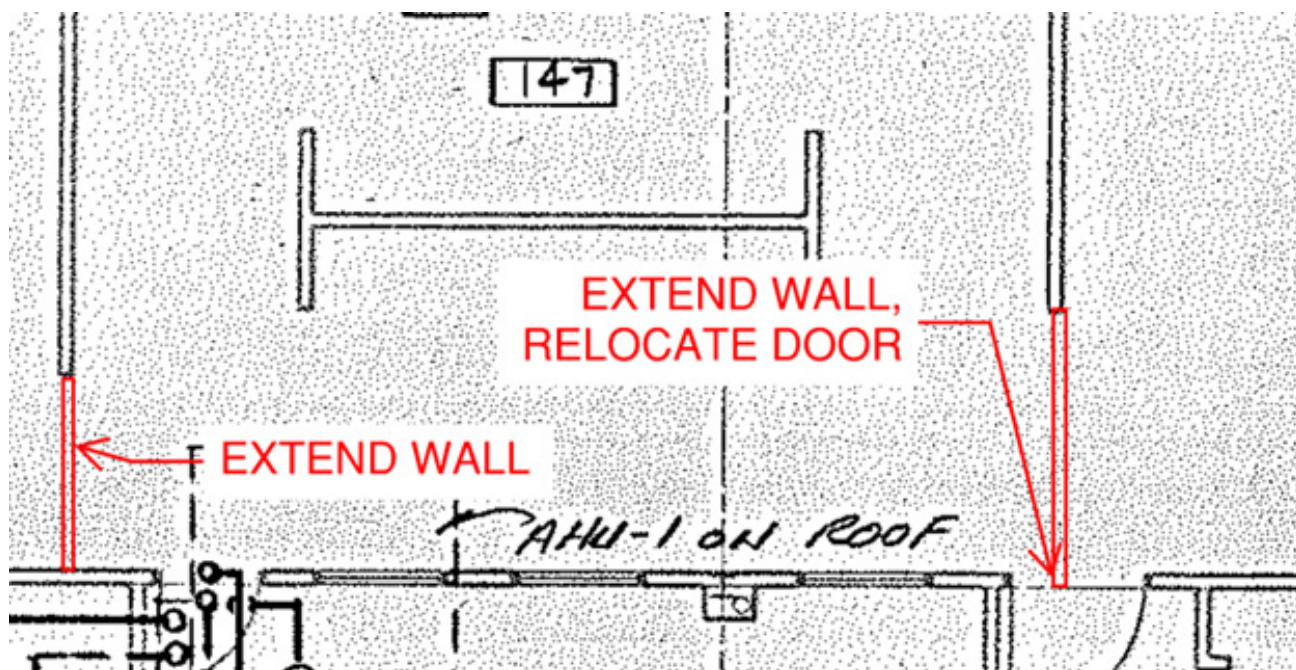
New Walls to Separate the Areas Served by MAU-1 and MAU-2
